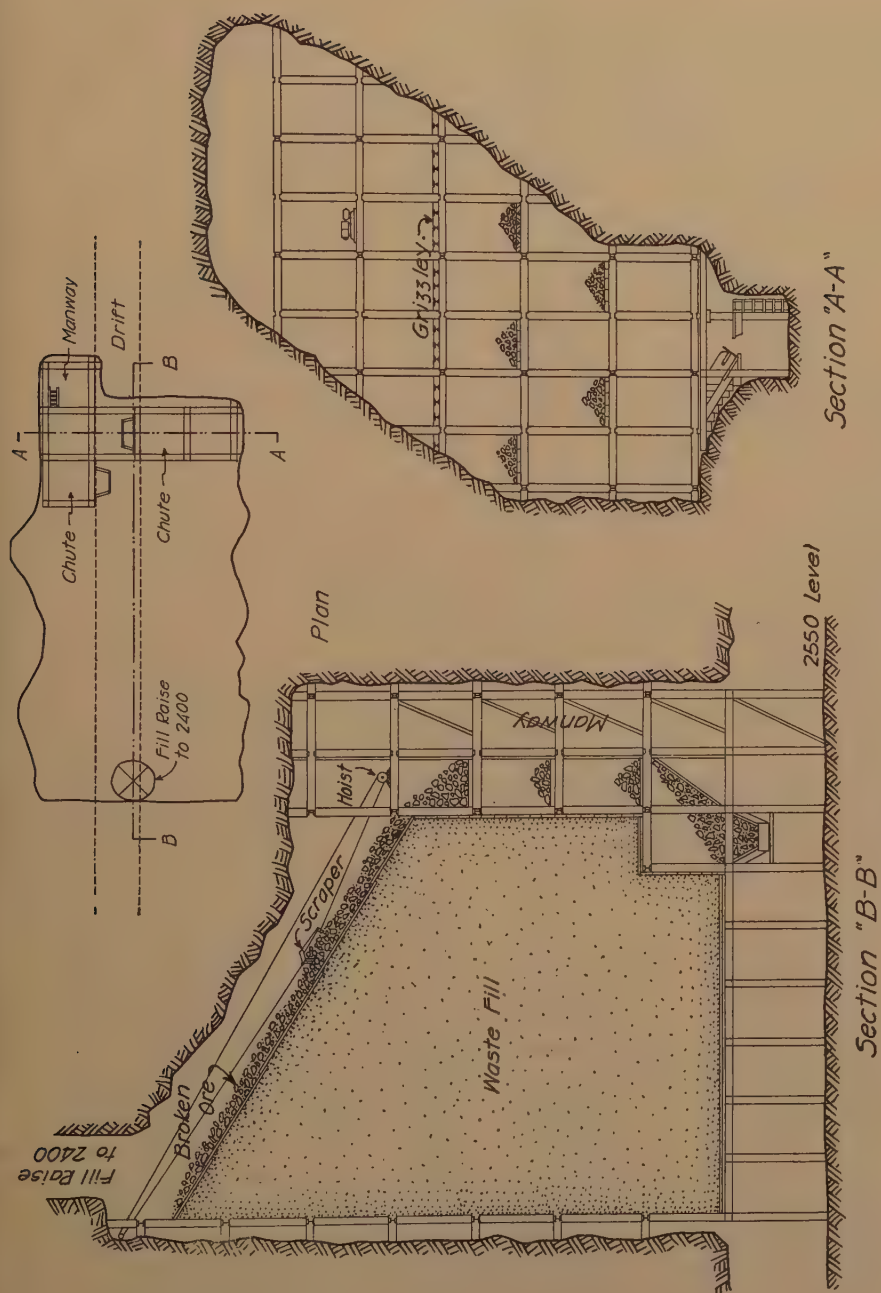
SILLING OUT NEW INCLINE CUT-AND-FILL STOPE.
